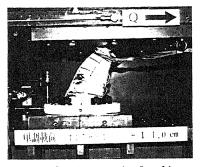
Monotonic Loading Test (T150-1) (Deformation 14cm)
